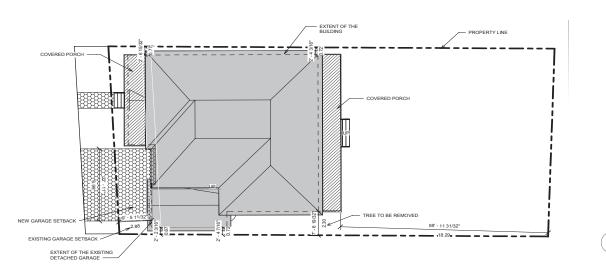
18 Byron Ave E. proposed site plan with parking for two vehicles to the south/front of the site. HCD plan recommends two single track driveways with turf installed between in order to minimize the impact of hard surfacing. Drawing by Third Layer Architects, 2021.
